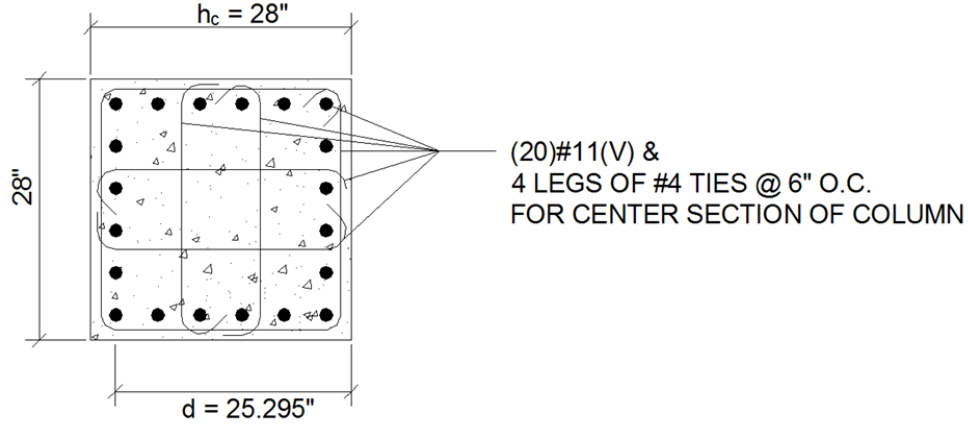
New exterior column cross-section at center section of column at ground floor level based on tsunami design.
